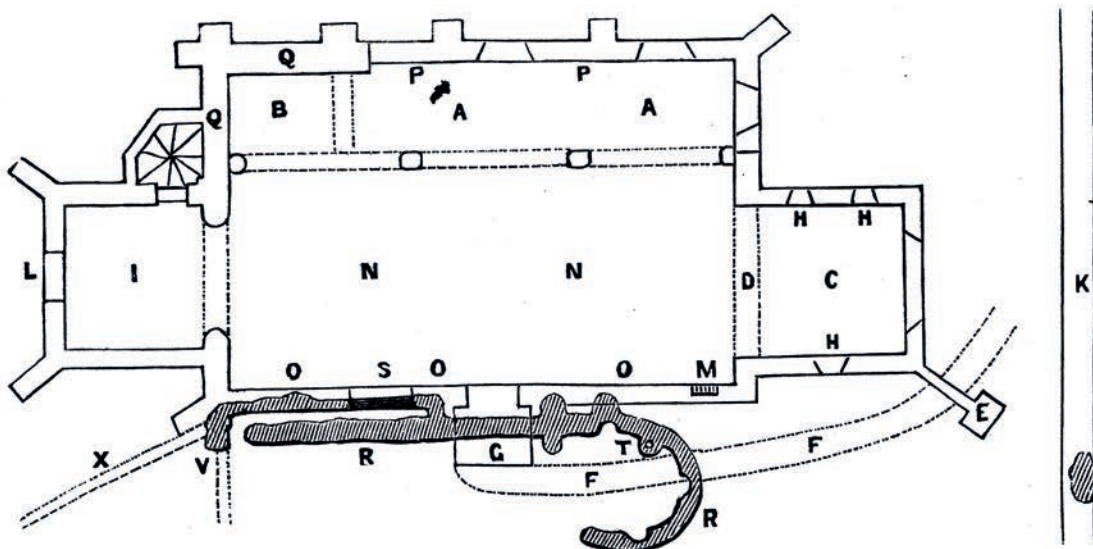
Sketch-plan of exposed church foundations from Jenkins' field notes, c 1860.
